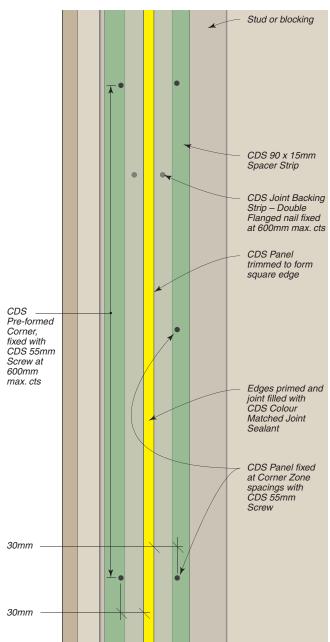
Typical Face Nailing at Square Edge Joint – Elevation
